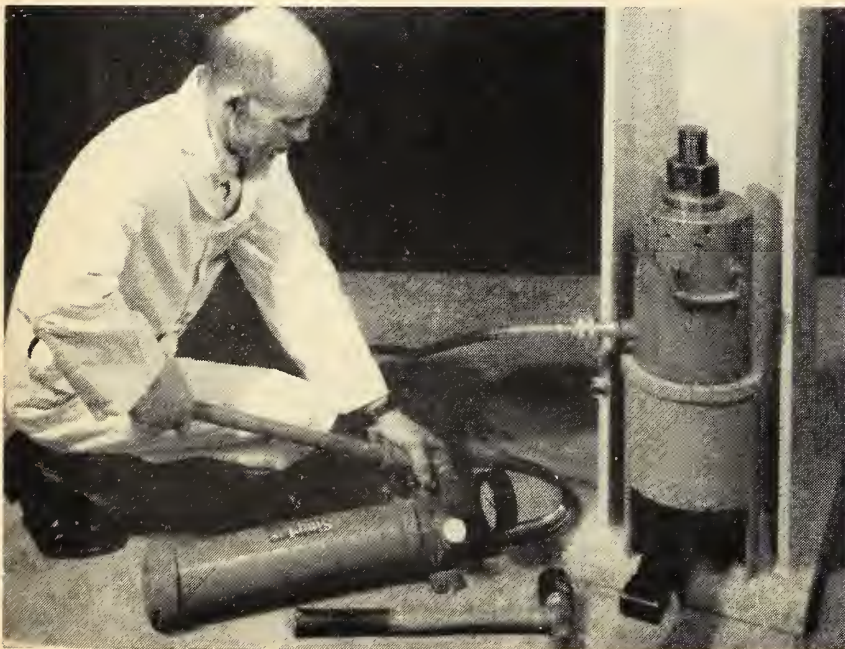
Loading test on Arctic housing roof panel with four jacks.
